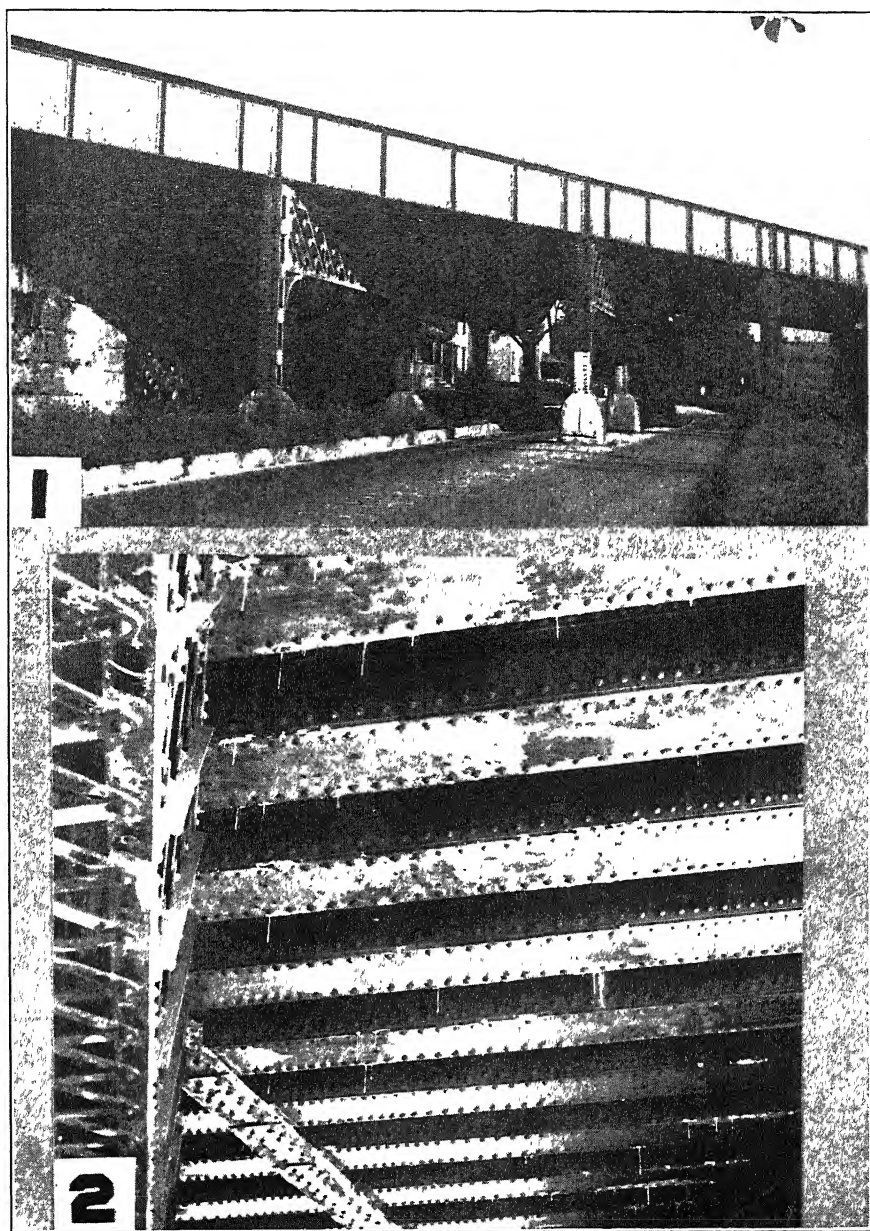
Railroad bridge crossing Bever Street. Wooster, Ohio.
